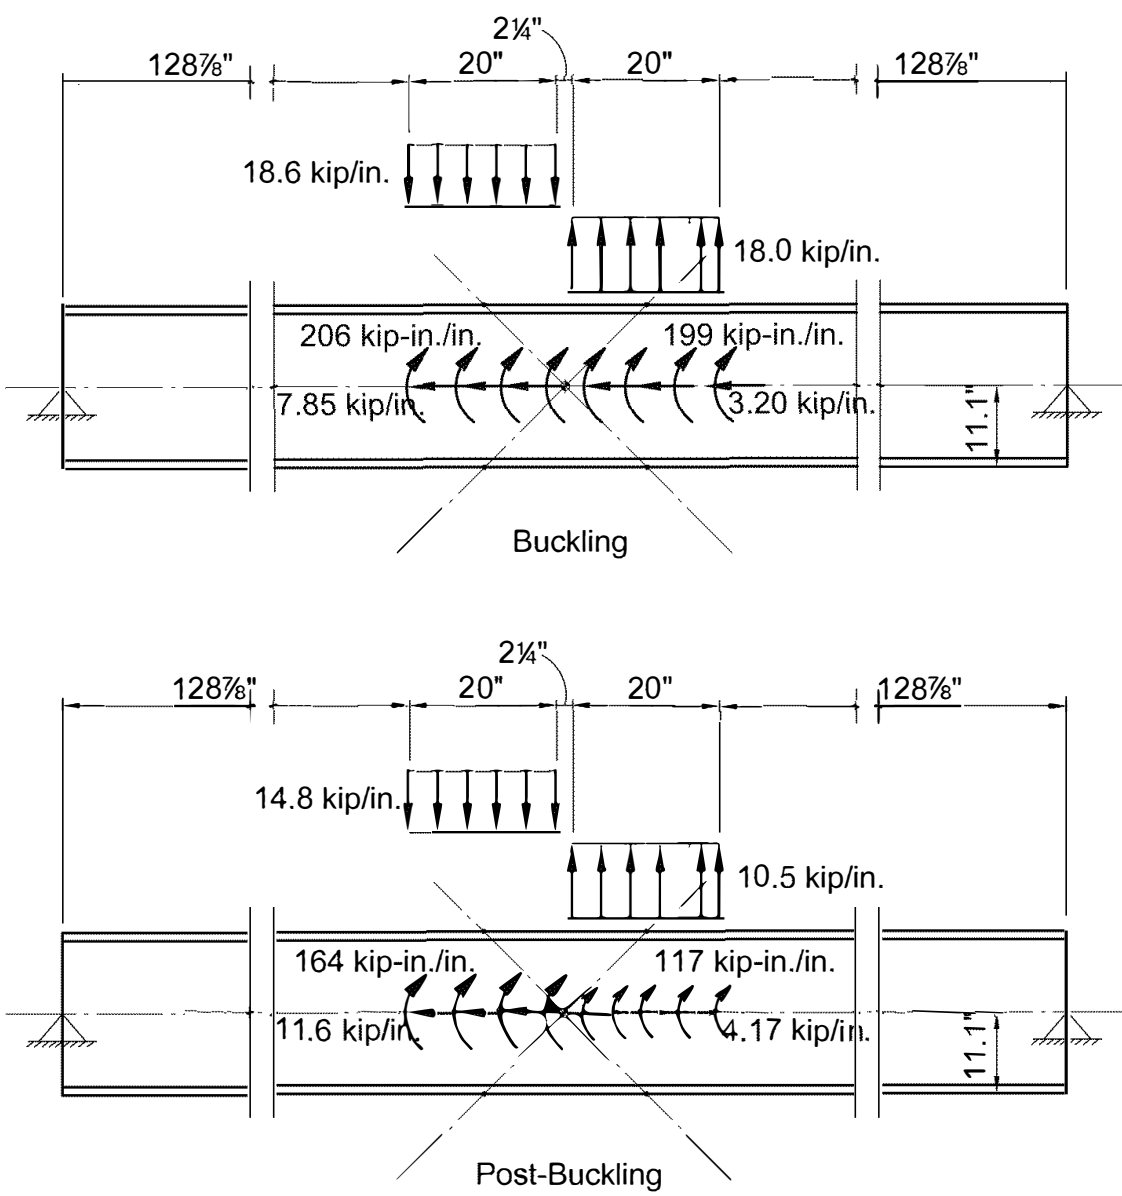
Gusset-beam interface forces/beam loading—ASD.
